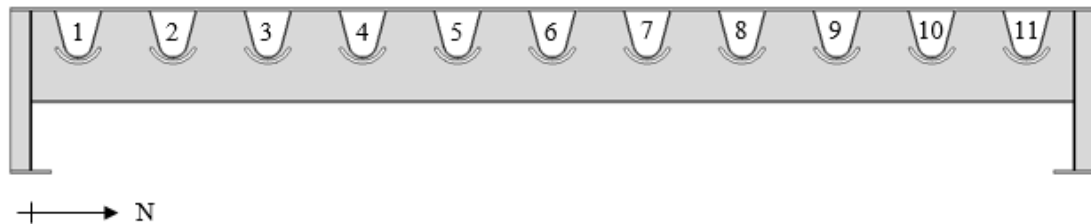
Illustration. Rib identifiers for plate girder model with Rib 1 on the south side of the deck.
